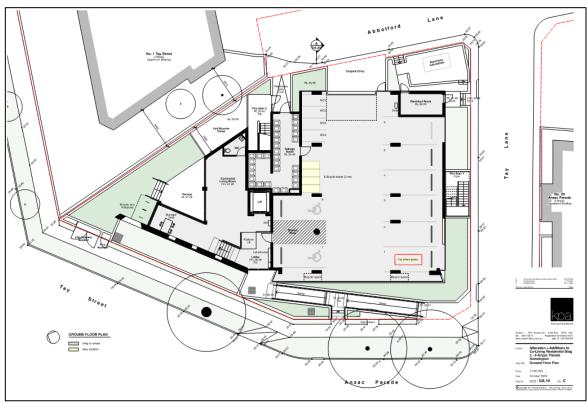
Proposed Ground Floor Plan for 2 Anzac Parade, Kensington (Source: Applicant)
